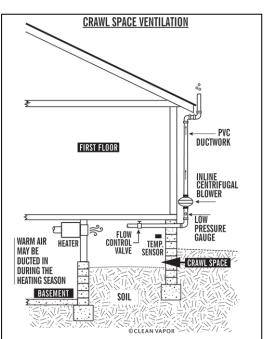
Example crawlspace ventilation system with fan located outside. Source: Clean Vapor, LLC, used with permission.
